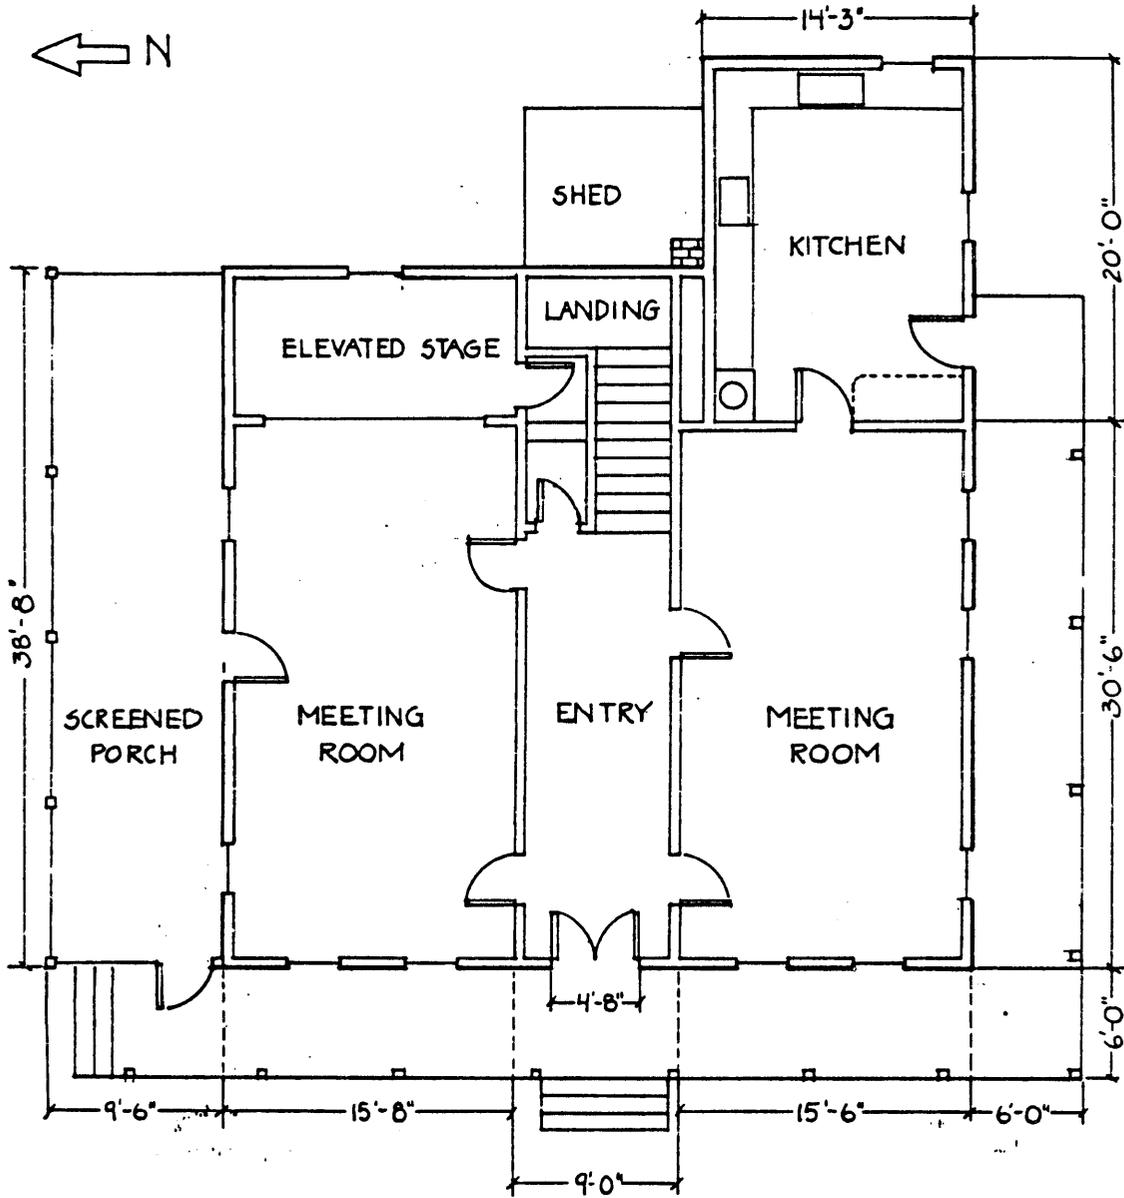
Floorplan of the downstairs, Lemon Cove Woman's Clubhouse.
